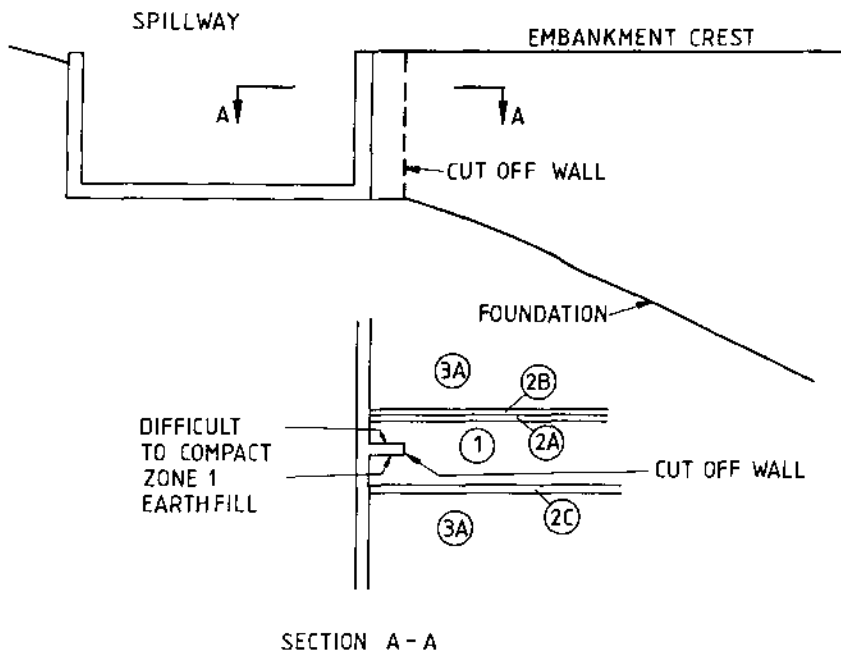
Contact between earthfill and spillway wall with a cutoff wall provided.
